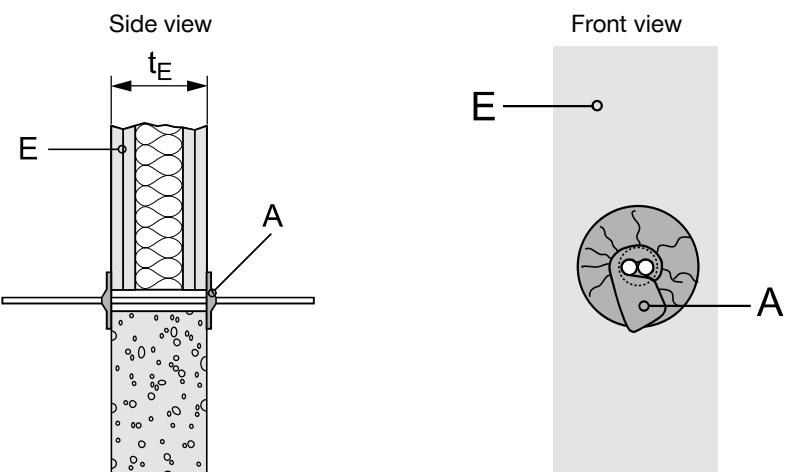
Hilti Firestop Cable Disc CFS-D 25 application
